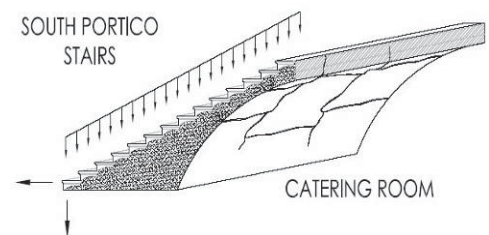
The cracks in the Catering Room ceiling may have resulted from settling below the South Portico Stairs.
